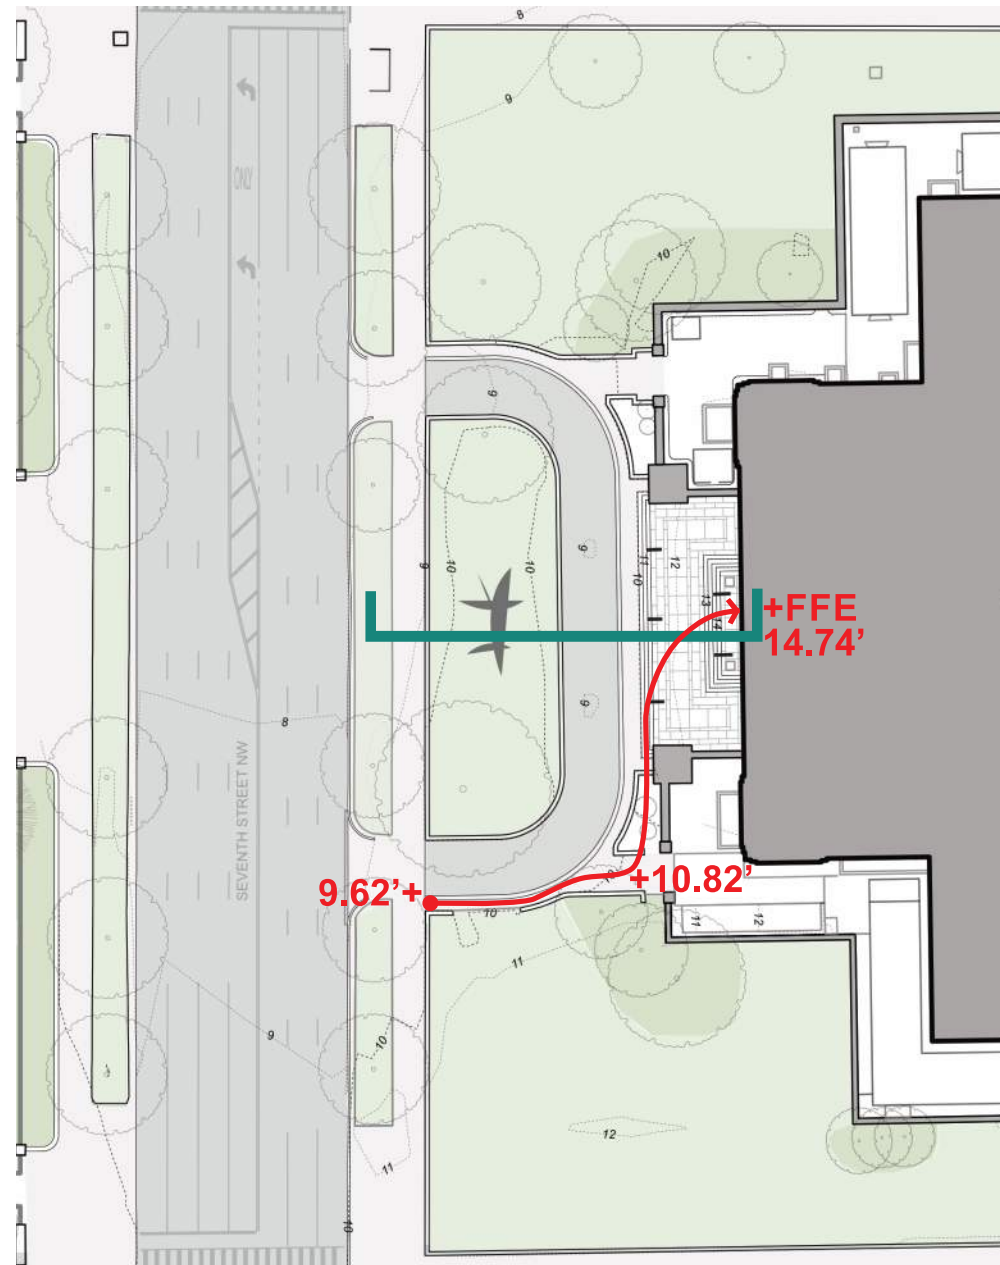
Key plan marking spot elevations along pedestrian route.
